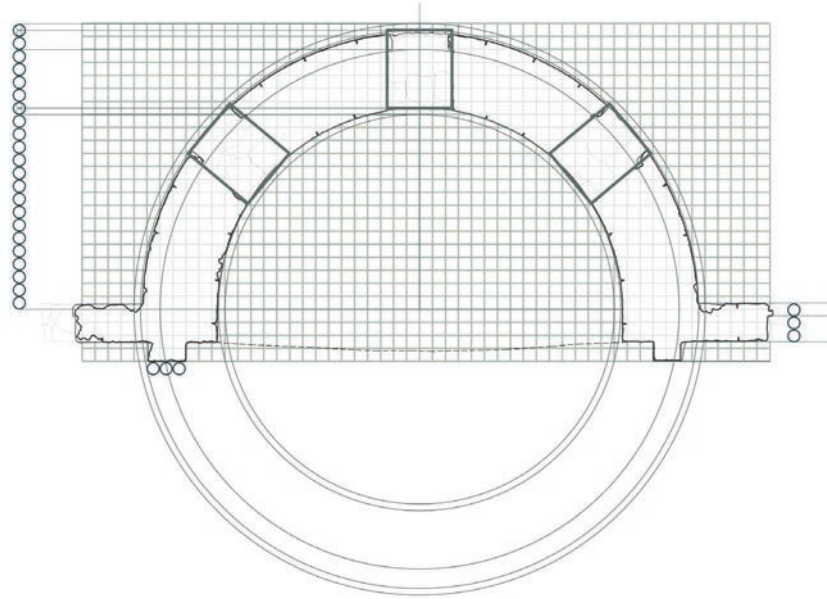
Geometric study in plan view on a grid with a module of 30.8 cm (Attic foot) (@AskGate).
